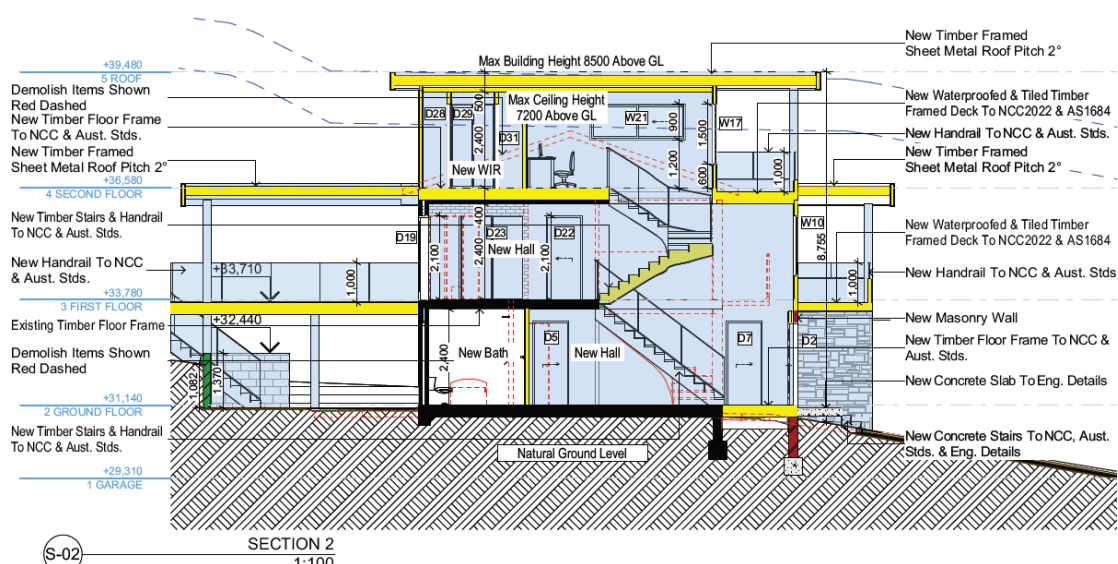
SECTION PLAN 31 Walworth Avenue, Newport. Source Rapid Plans.
